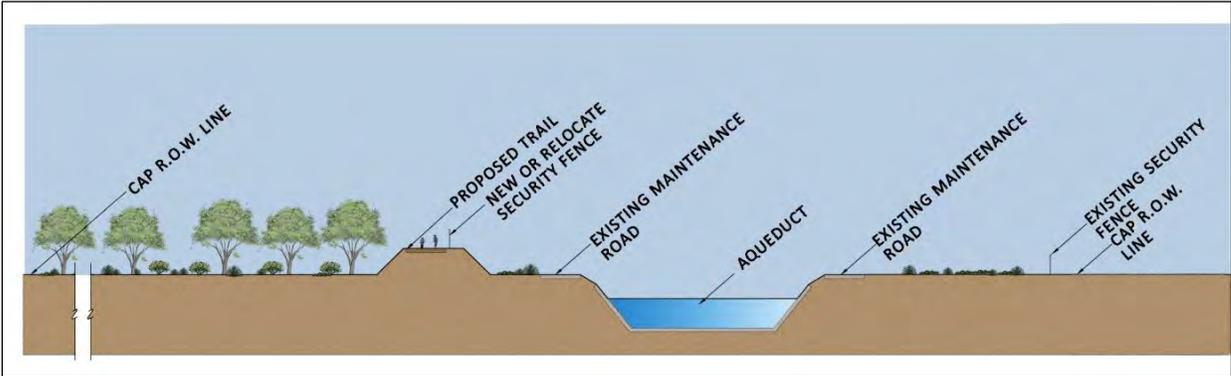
G: Cross-Section PIC-2 – Typical of Mile Post 1.4 to 4.6
